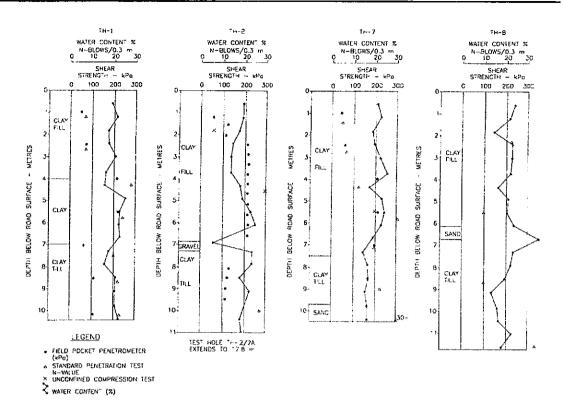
Big Mountain Creek culvert - test hole logs and test results.
